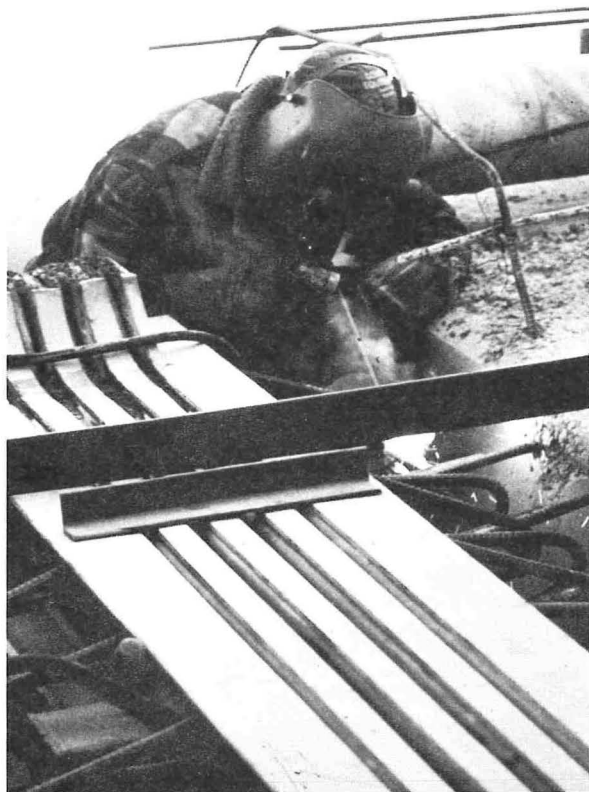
A. A four-tube (6-inch movement) modular system being welded to the main reinforcement of a post-tensioned concrete bridge.
